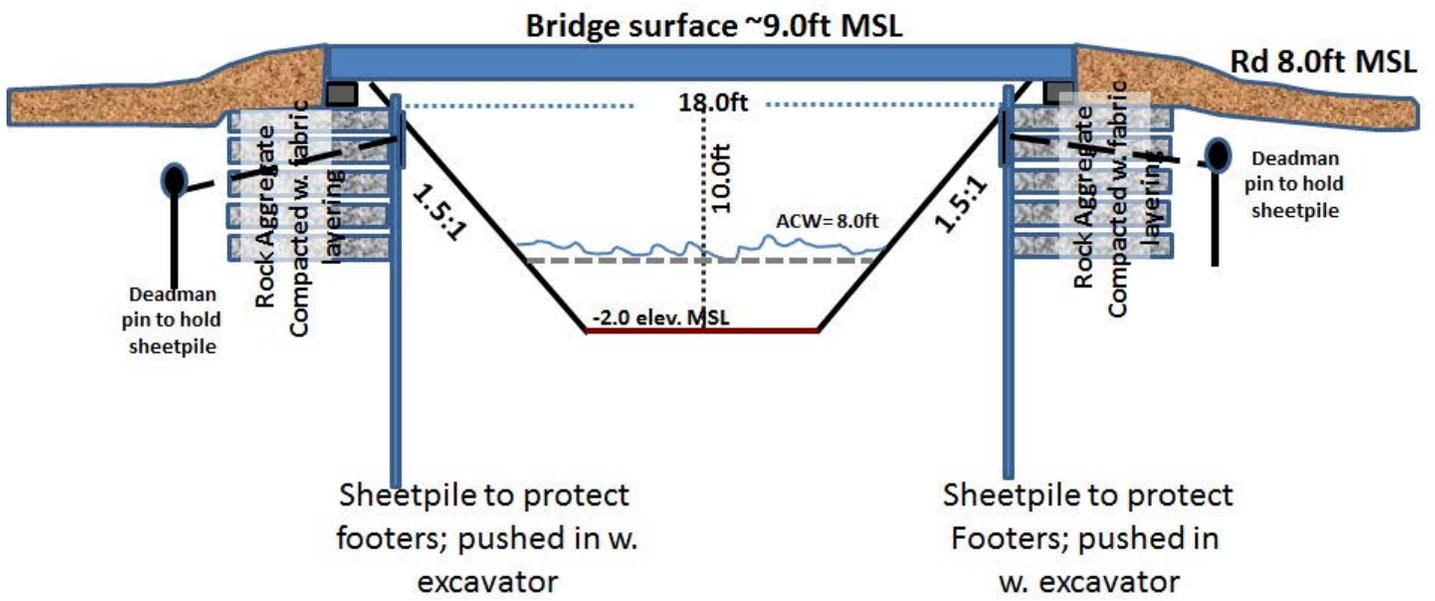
Bridge design for the North Bank Access project berm/road construction.
